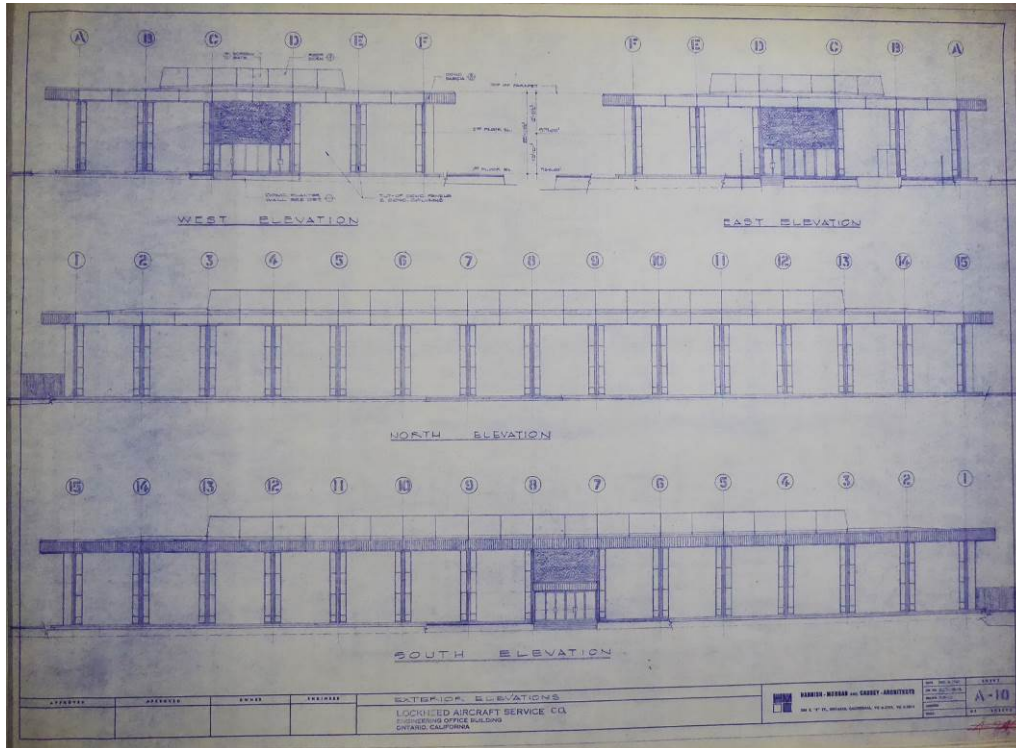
Elevations. Architect's drawing, 1967. Source: LAWA records.
